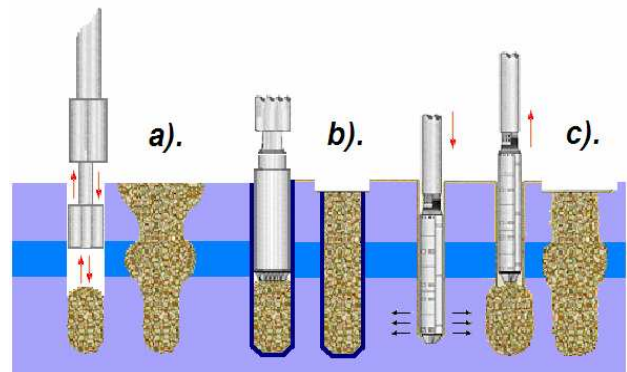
The subsoil reinforced by: a). gravel columns made by percussive consolidation b). gravel columns in geosynthetic sleeves, c). gravel columns made by vibroreplacement.
